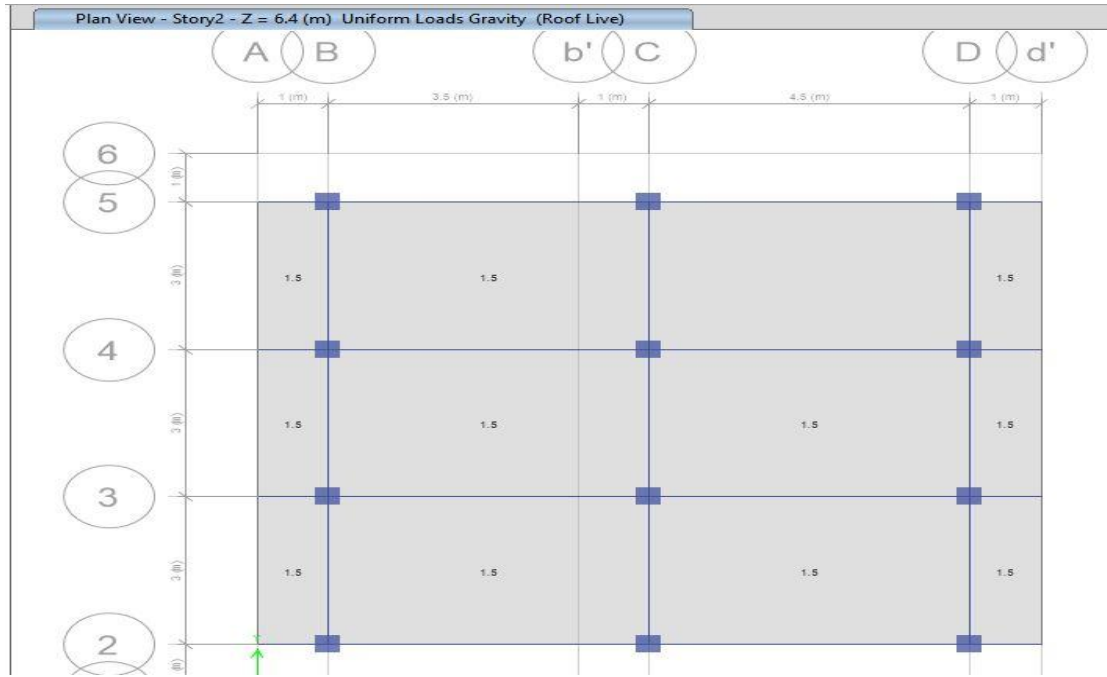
Roof Live Load(Second Floor in kN/m^2)
